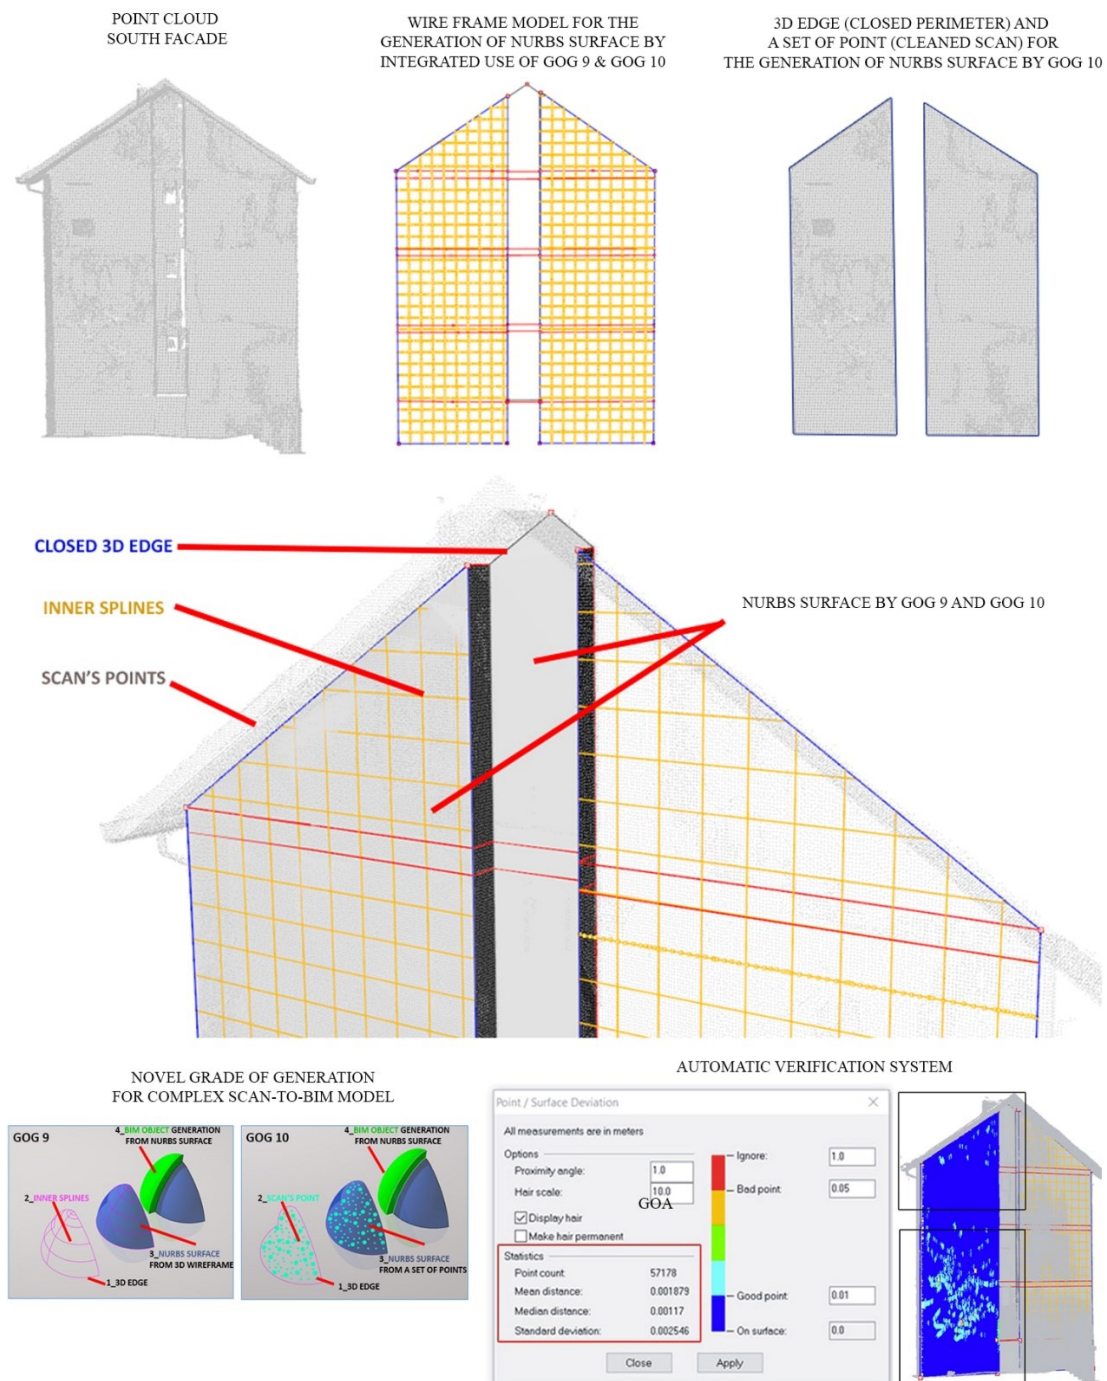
Application of GOG 10. The GOA of each building façade is around 2.5 mm.
